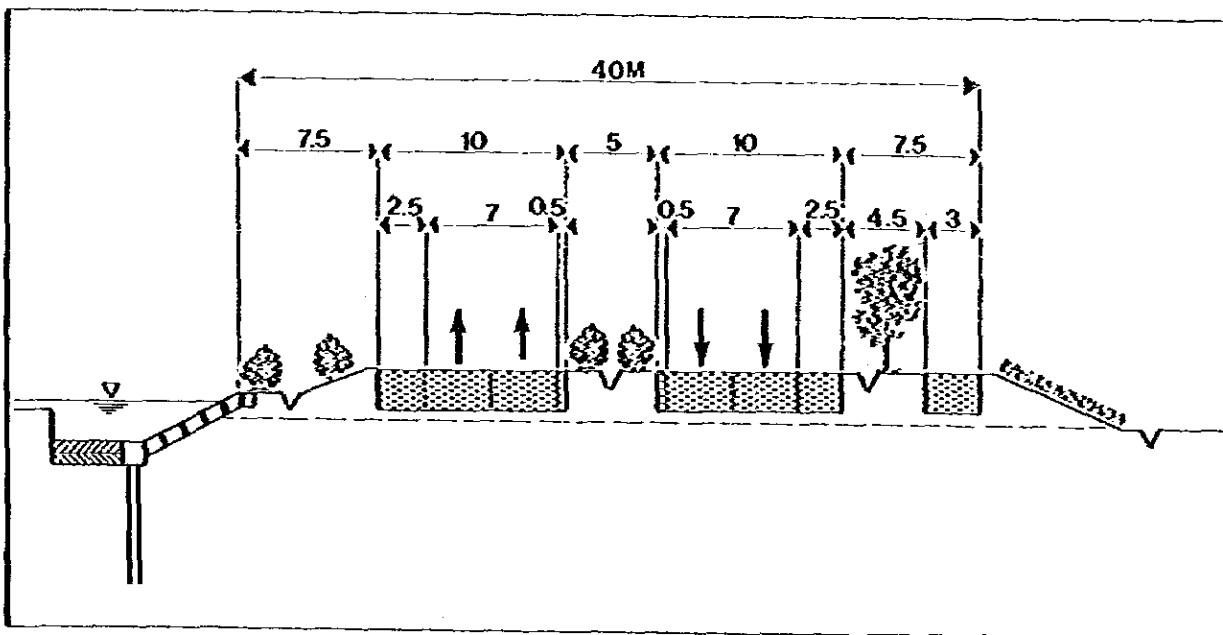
TYPICAL CROSS SECTION OF THE TOLL EXPRESSWAY ACCESS ROAD
